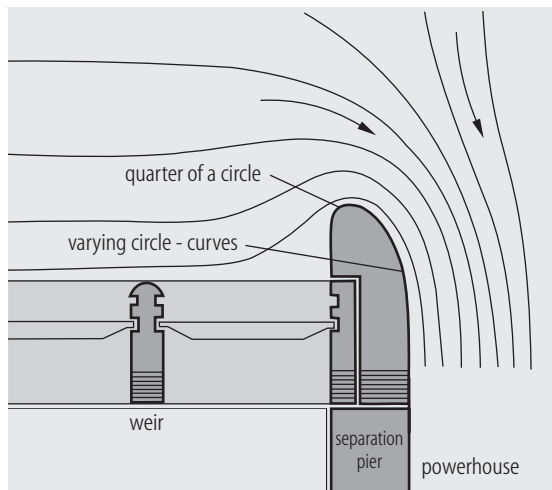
Construction of the separation pier between powerhouse and weir.
